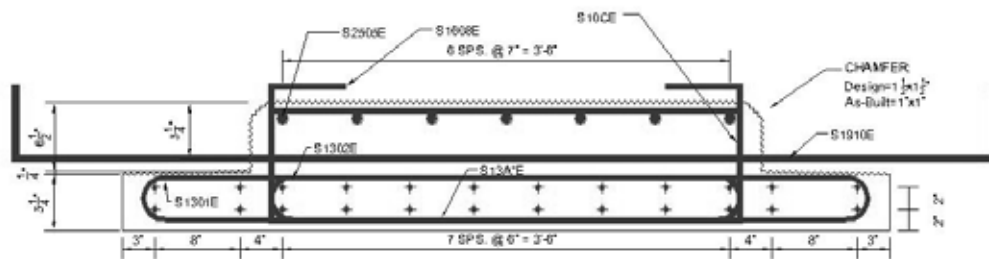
As-built cross section and reinforcement details for the west end of Beam 2N
